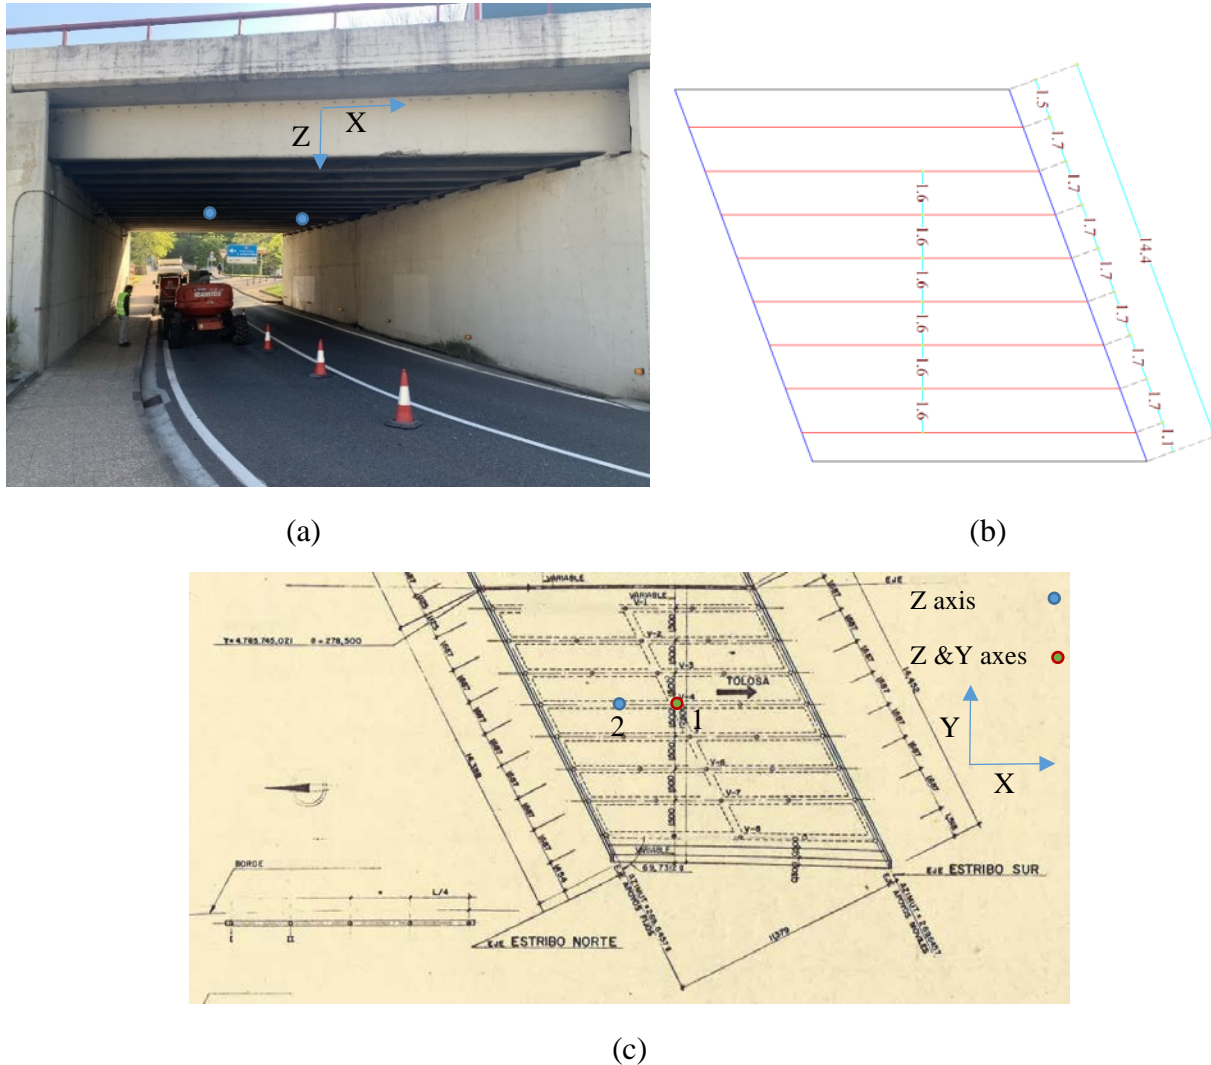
Andoin Bridge: a) A photo of the bridge before instrumentation, b) The dimensions of the bridge under study.
